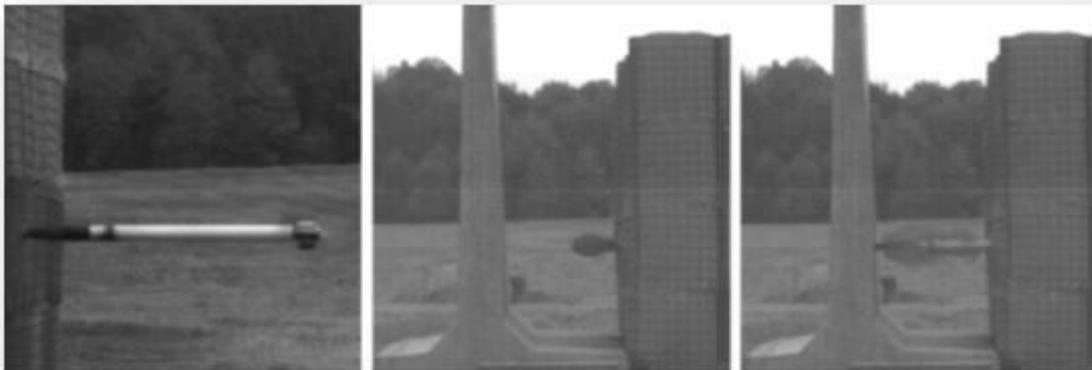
A demonstration of a rocket penetrating a normal strength steel bar reinforcement blast wall and earth filled wall. (Dept. of Defence 2023)
